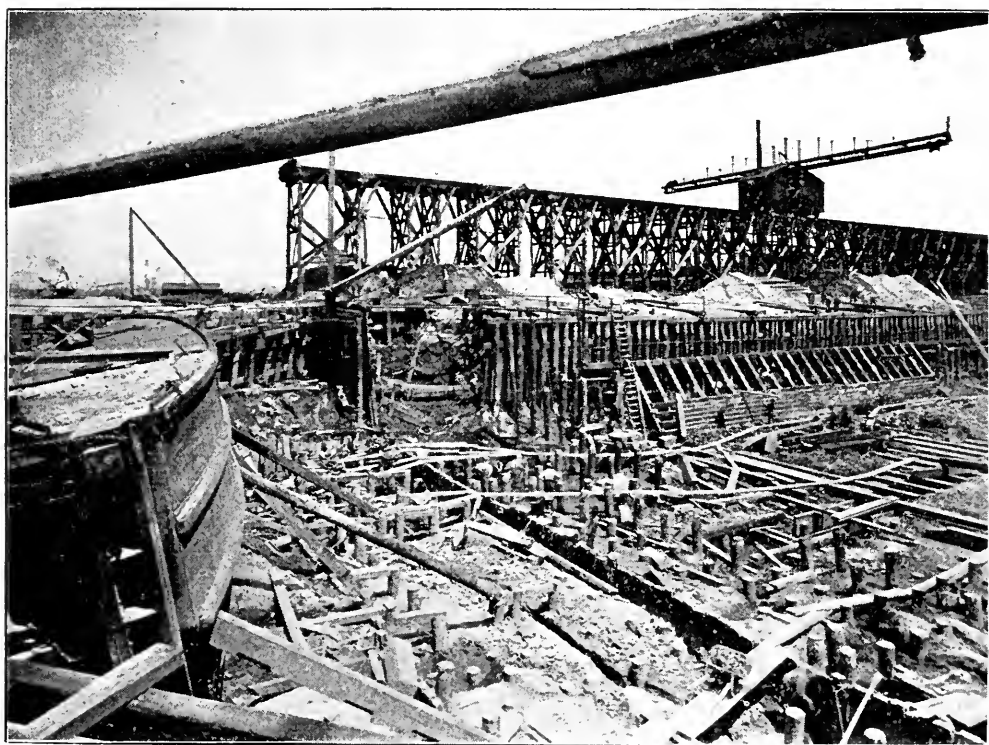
SHOWING SHEETING AND FOUNDATION PILES UNDER ENTRANCE.
